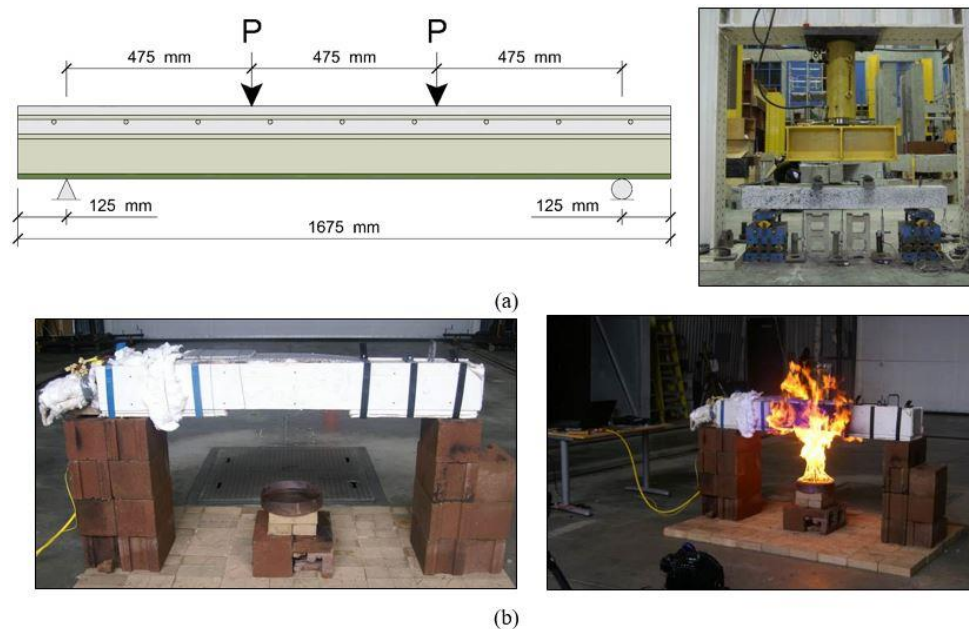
(a) Typical experimental test setup and loading configuration; (b) pool fire burn setup.
